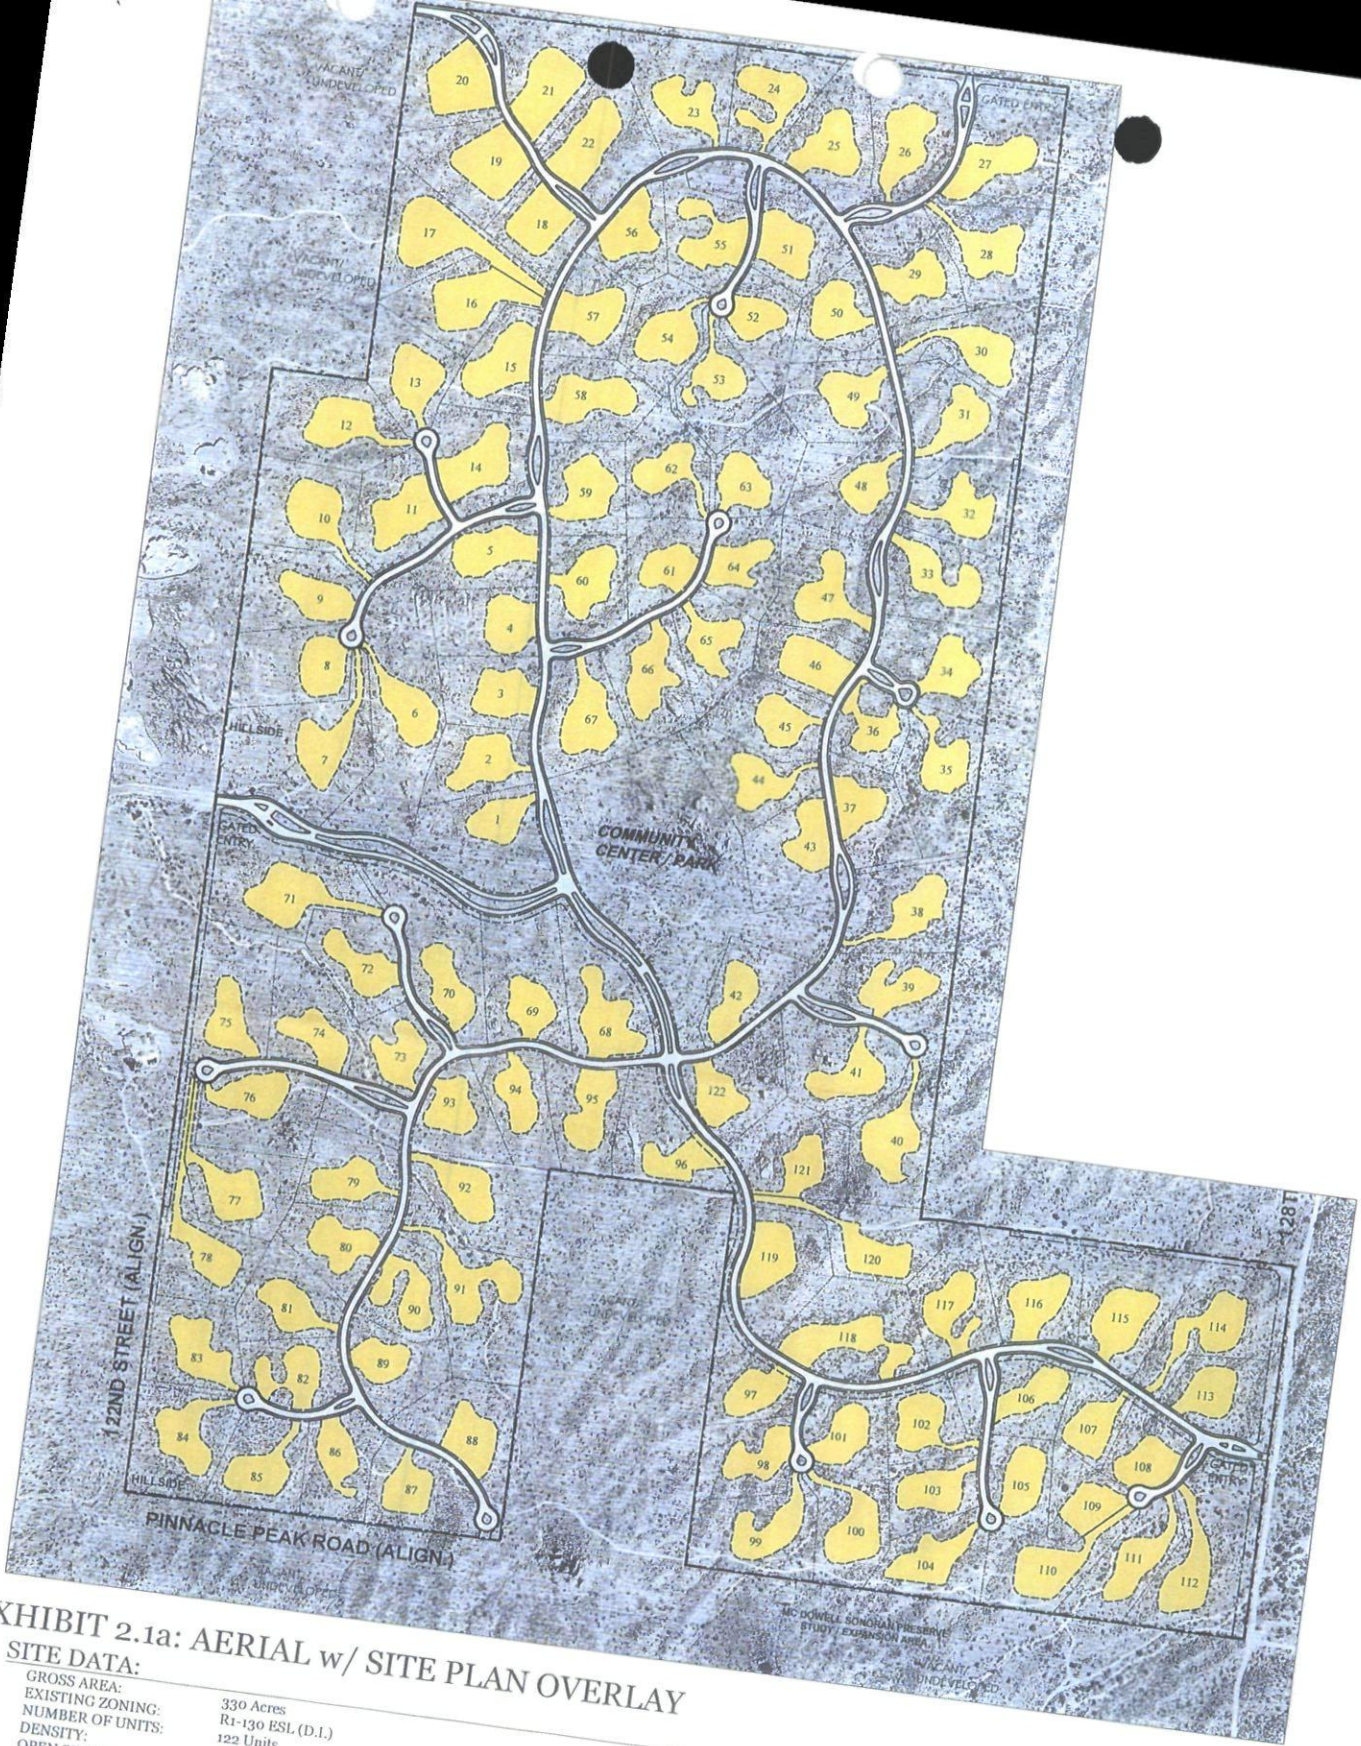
AERIAL w/ SITE PLAN OVERLAY
